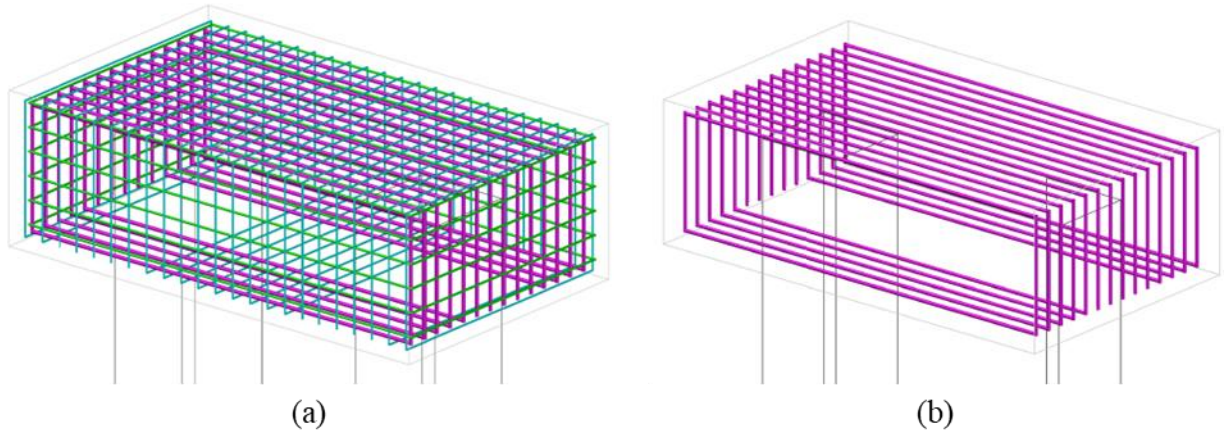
Reinforcement in 30-inch pile caps, (a) all reinforcement and (b) Bar 2A (#9 bars) rebar provided
